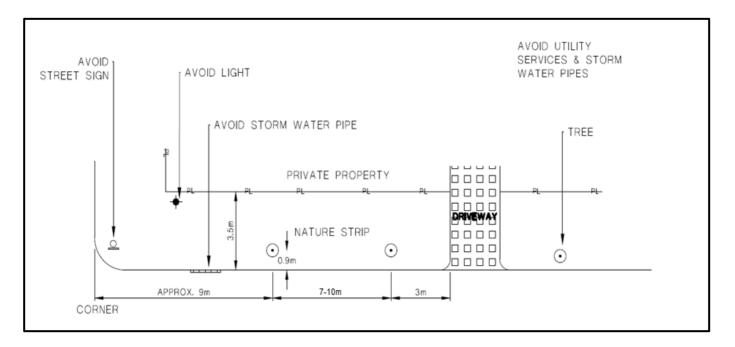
Planting Guidelines for Street Trees on Local Roads (No Footpath)
